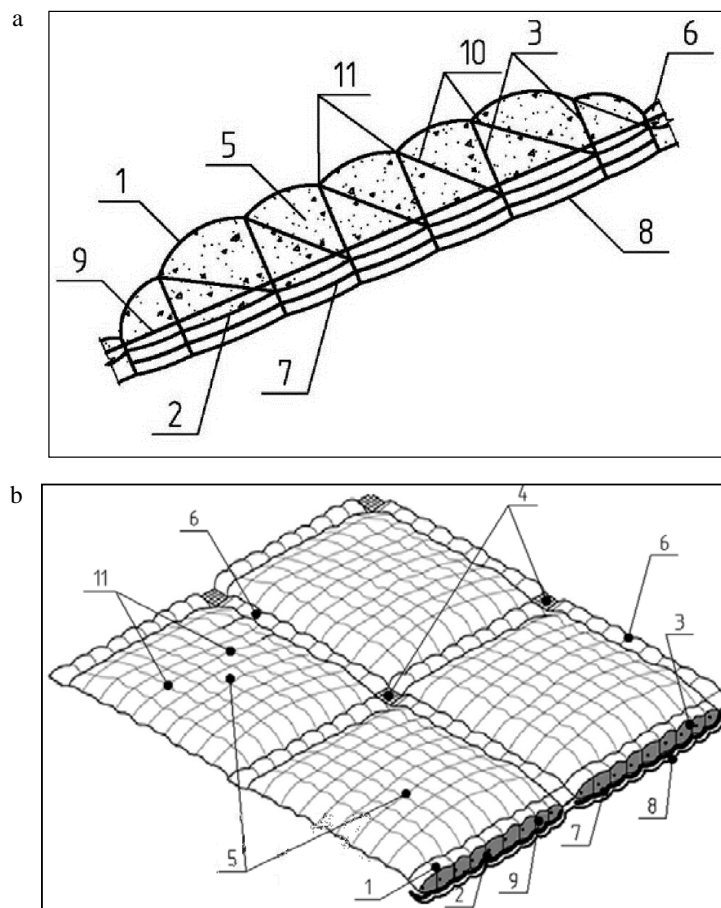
Scheme of construction improvement of concrete filling textile mats: (a) cross section, profile drawing; (b) plan.
